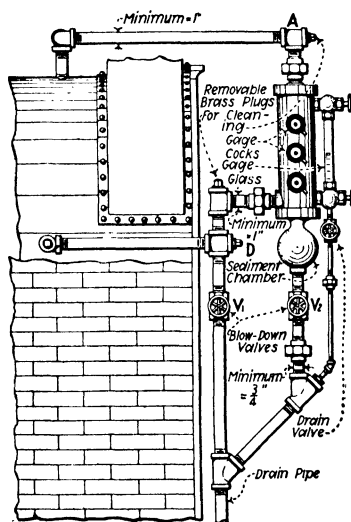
A properly-connected water column. (At *A* and *D* either outside-screw-and-yoke-type gate valves or stop cocks, with levers permanently fastened thereto, may be used.)
